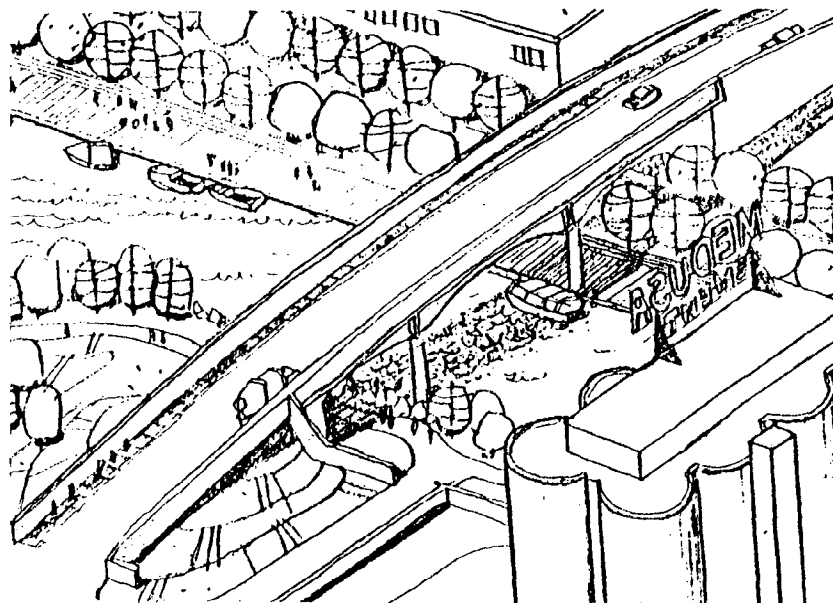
TRUCK/SERVICE BRIDGE ELEVATION
